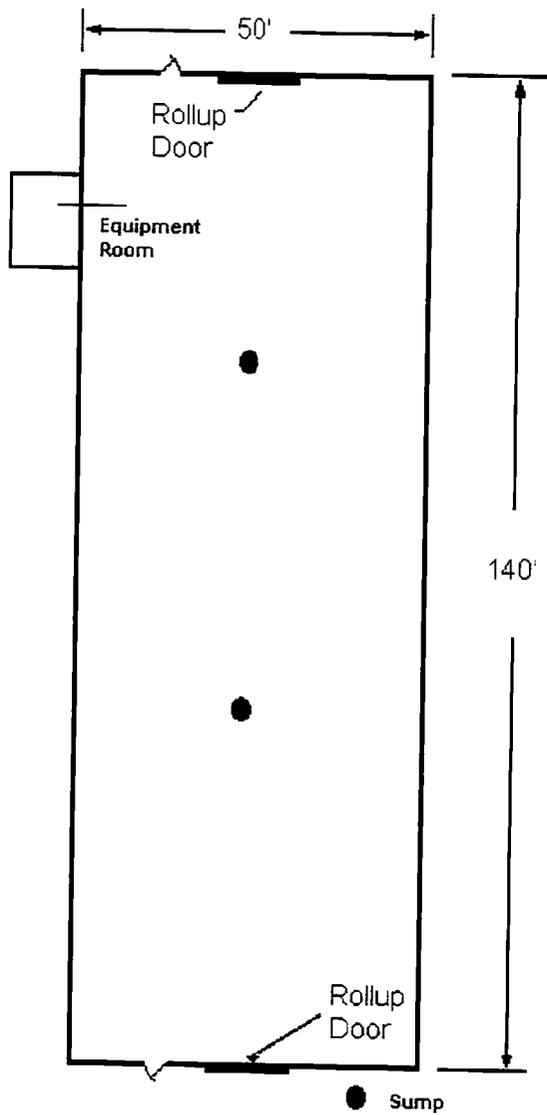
CH-TRU Waste Storage Facility, Building 7572.
